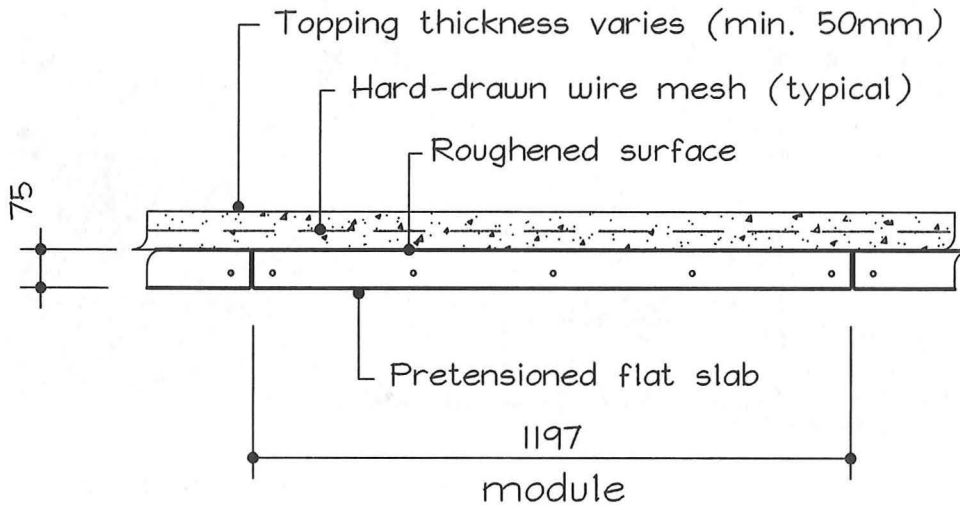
Typical composite section of pretensioned flat slab (Unispan) flooring
